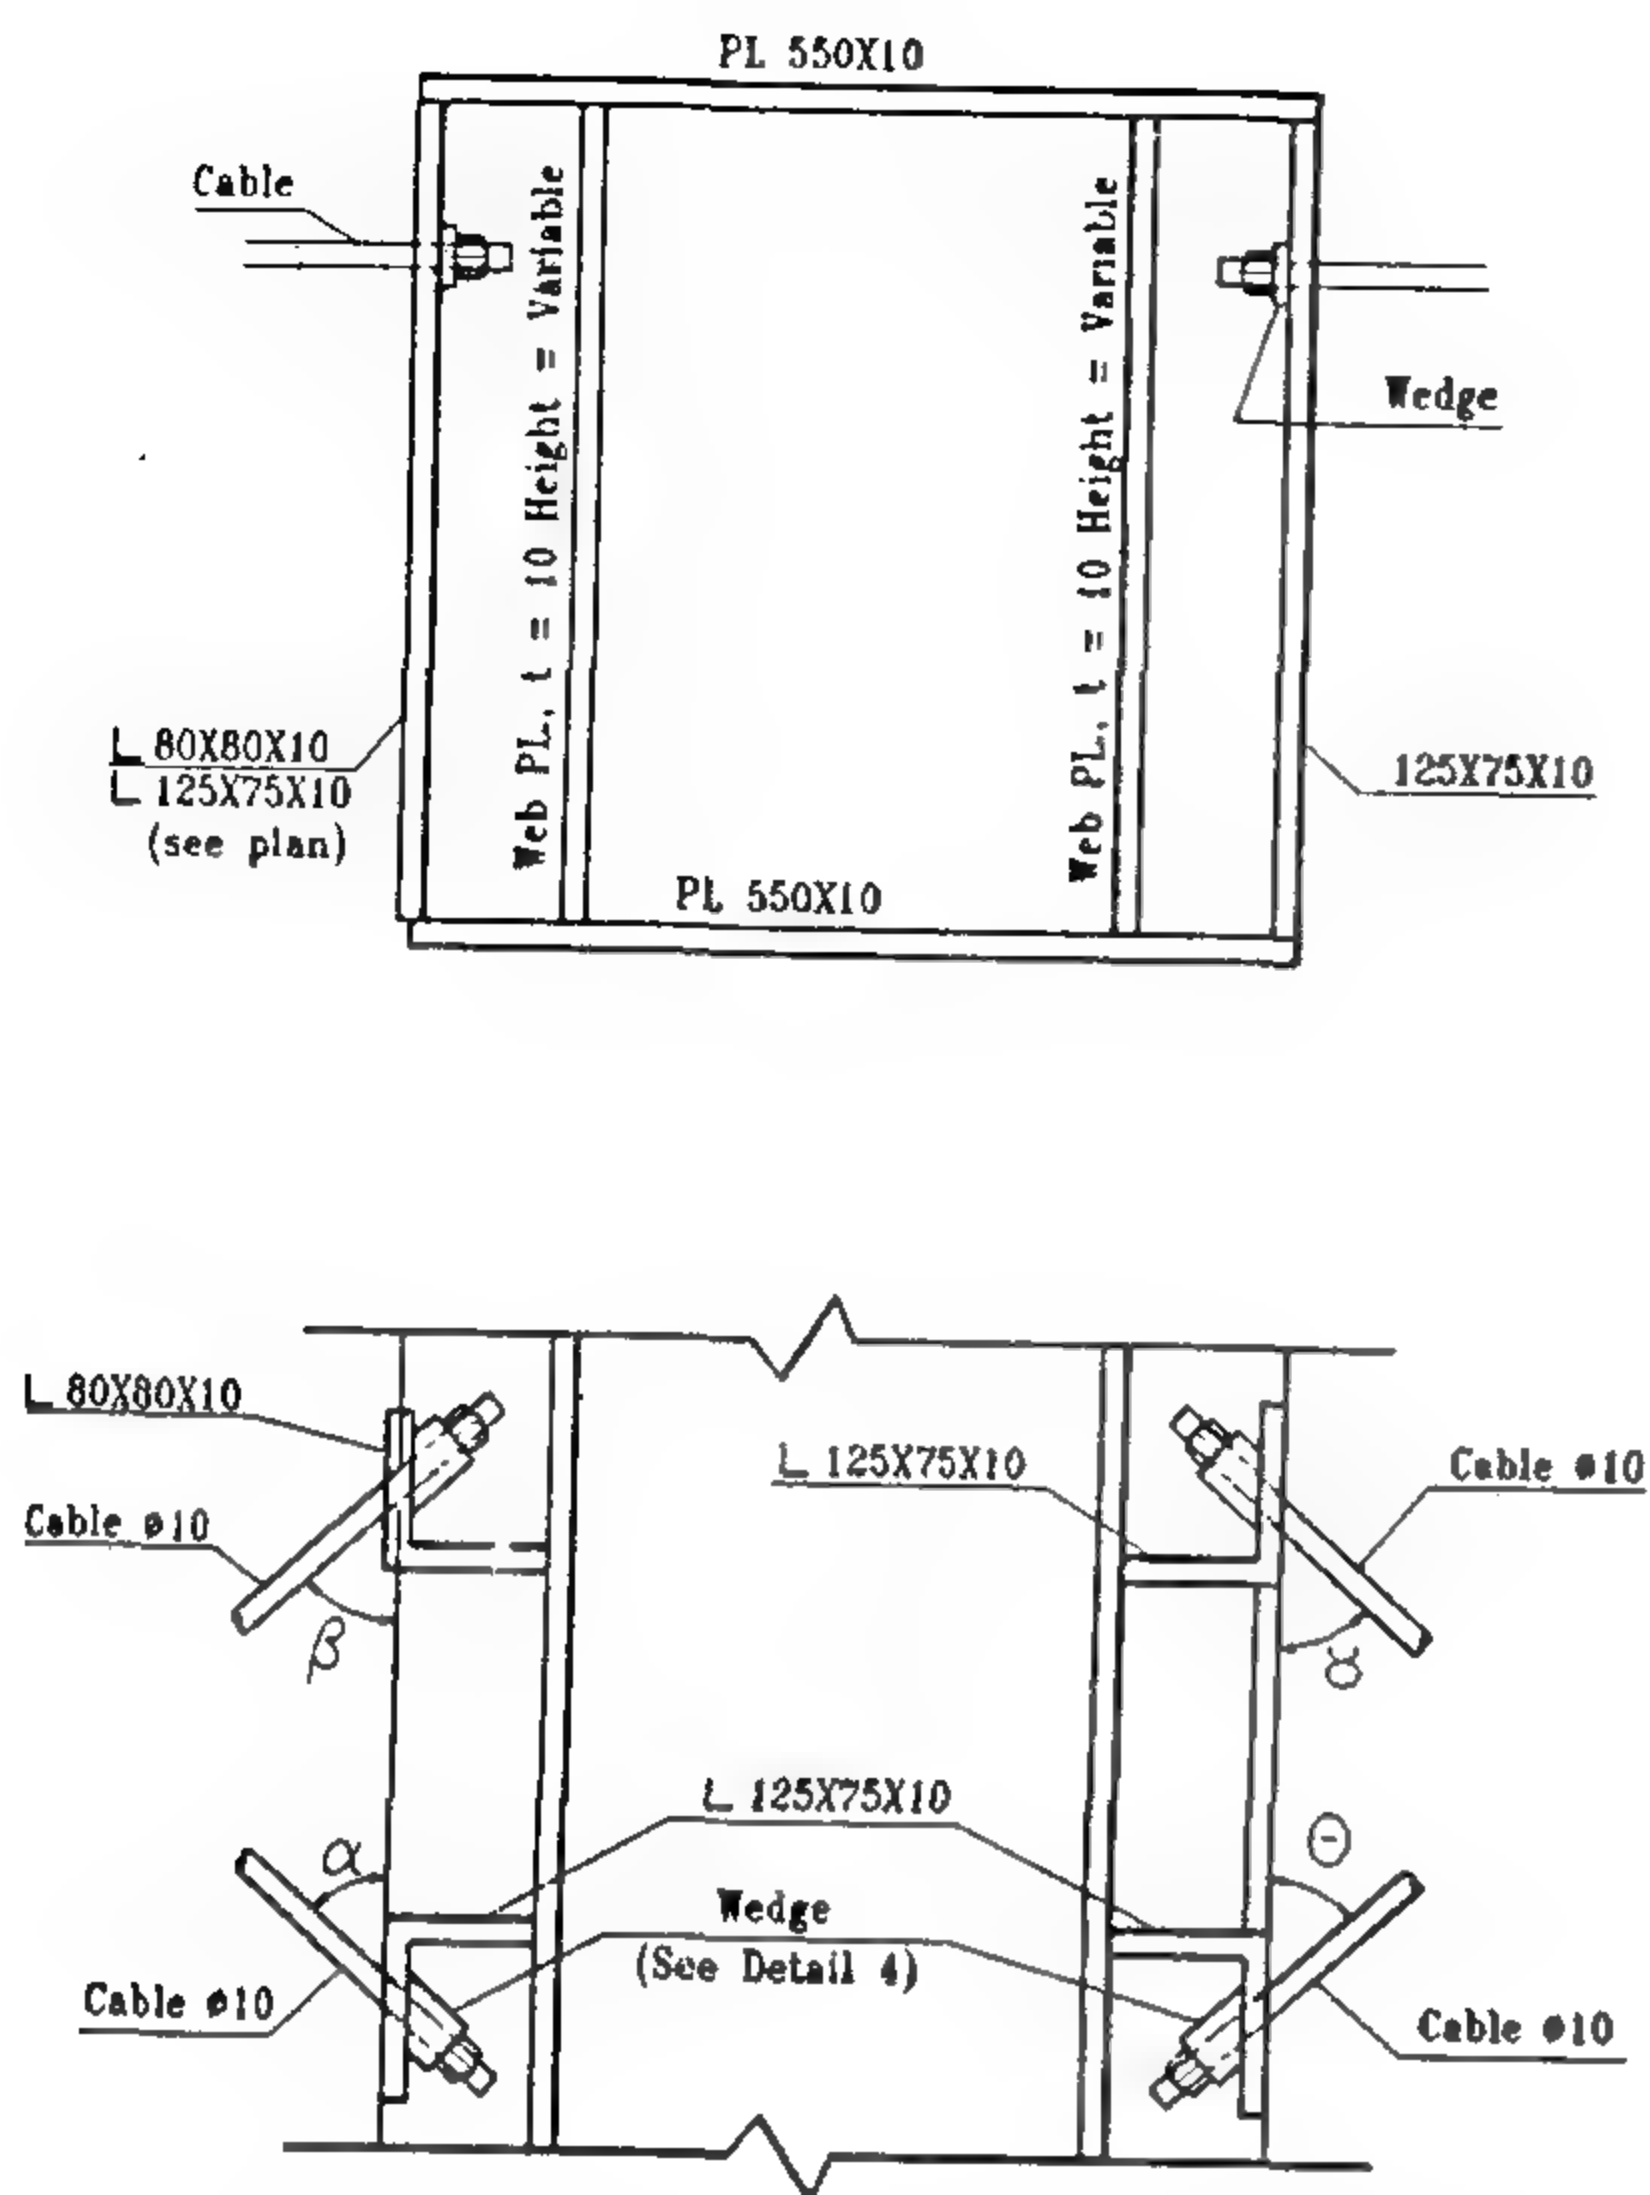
(c) Connection of cables to plate girder. (Detail III)
